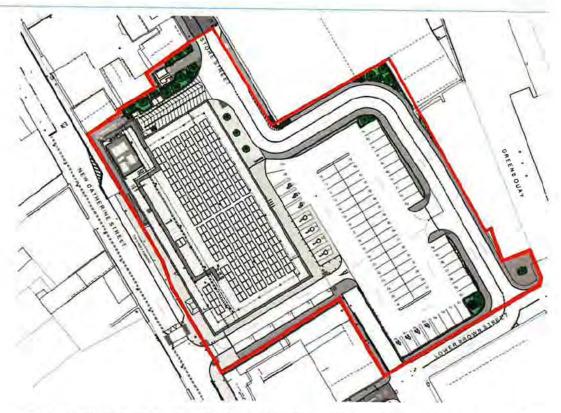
Extract from drawing no. 20984-THPK-27-XX-DR-A-103 "Proposed Site Layout" showing the proposed site and panel layout.
